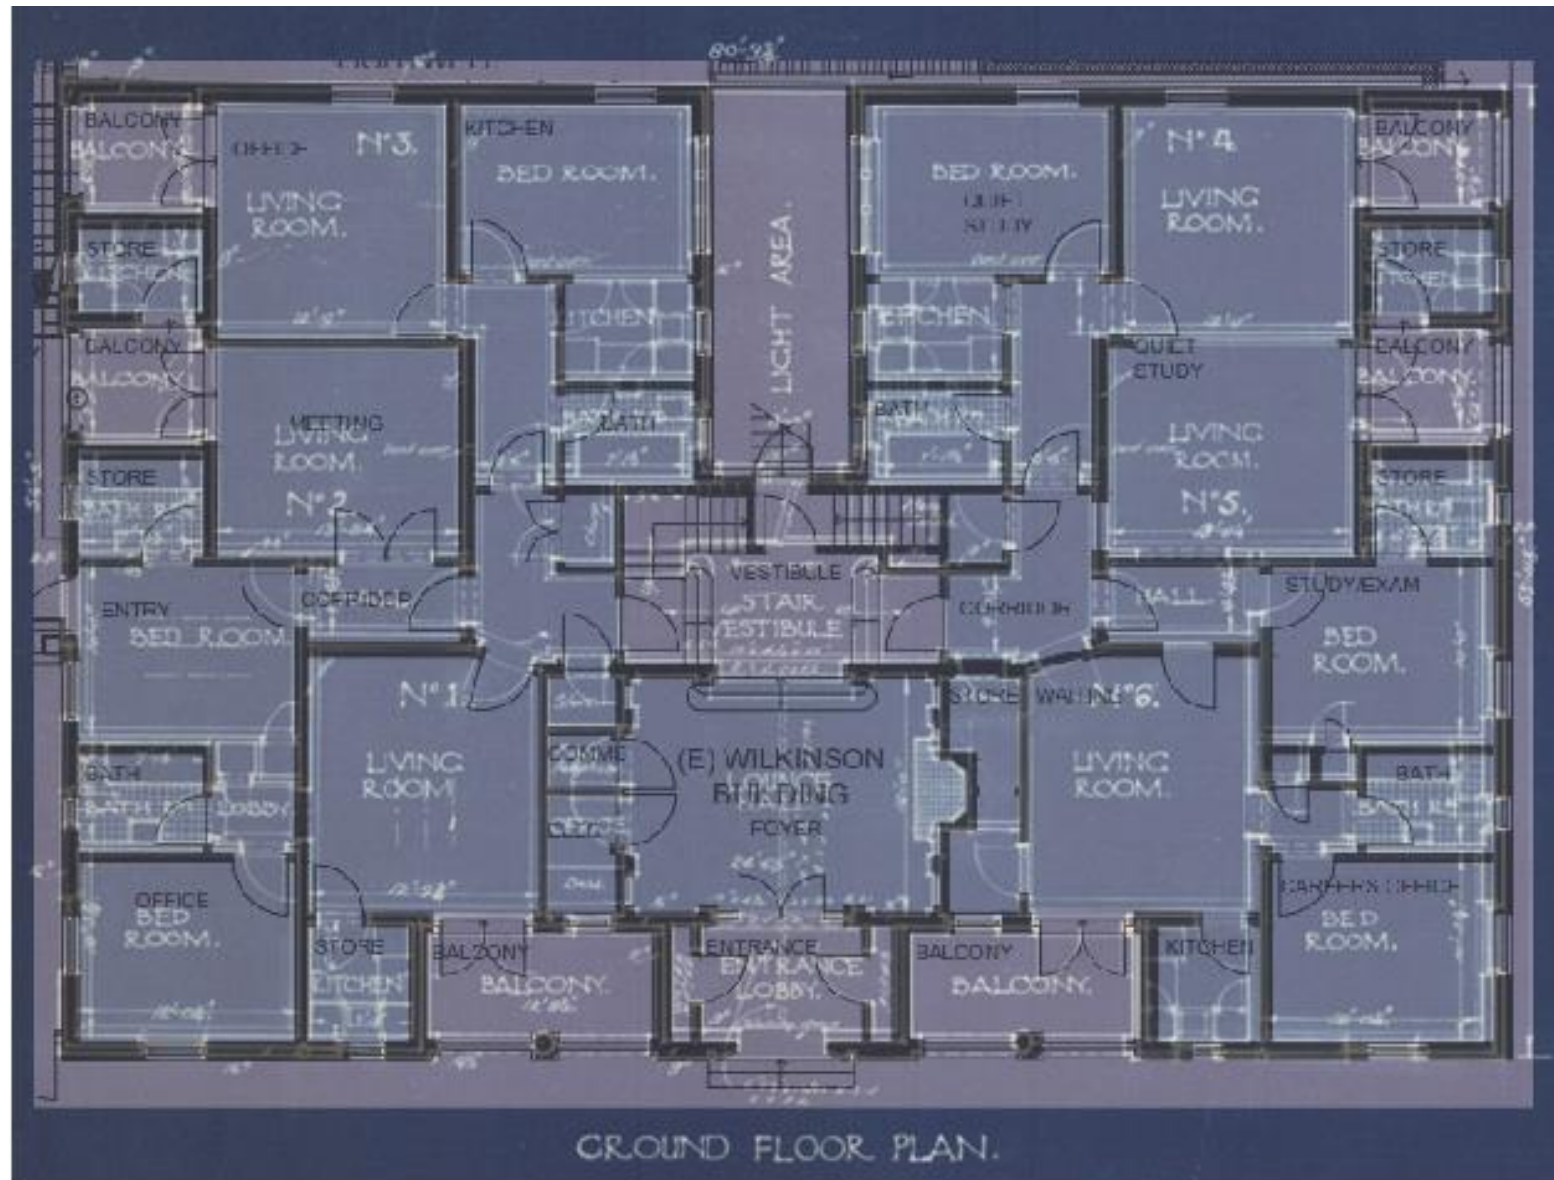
Overlay of original (back layer) and existing (top) ground level plans.
